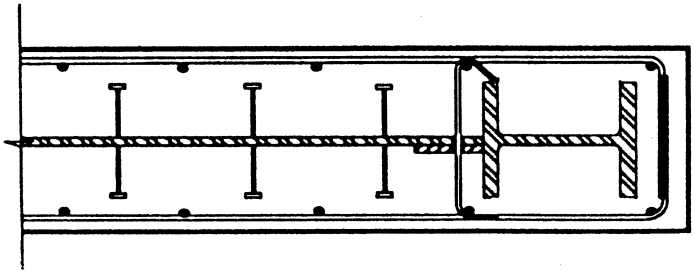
Concrete stiffened steel shear wall with composite (encased) boundary member.
